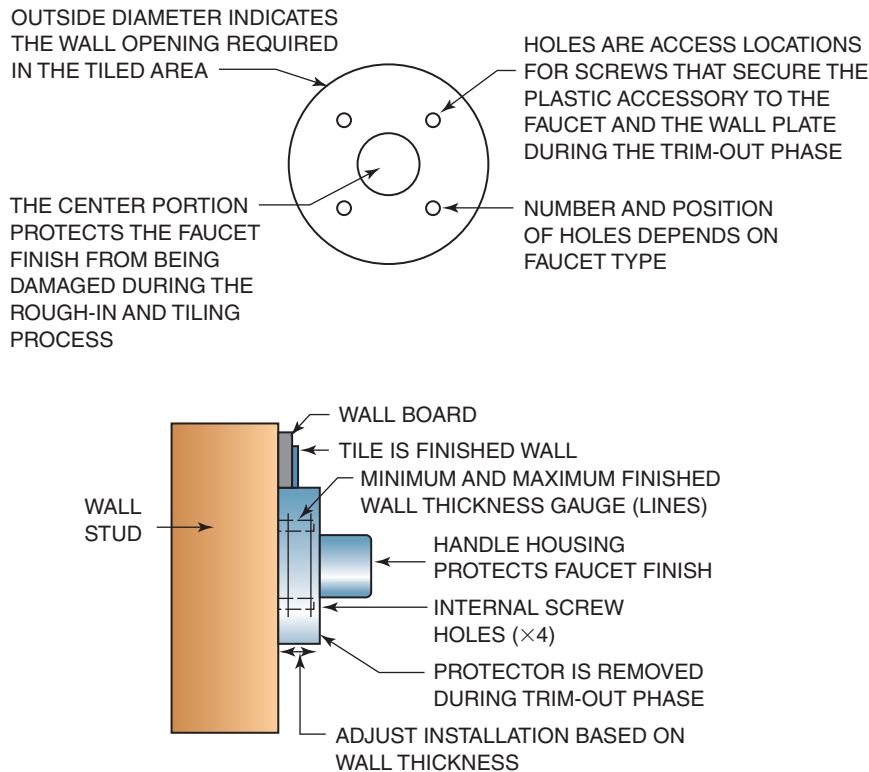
A plastic protector and wall-thickness gauge accessory protects the faucet finish and indicates the faucet installation in a wall.
